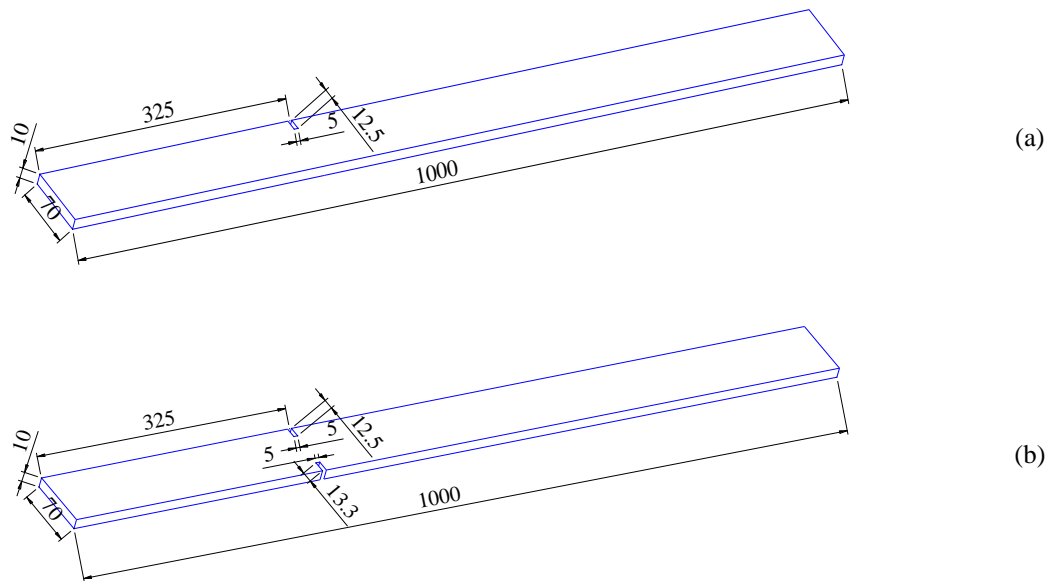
The layout of the damage beam (a) scenario 1, (b) scenario 2
